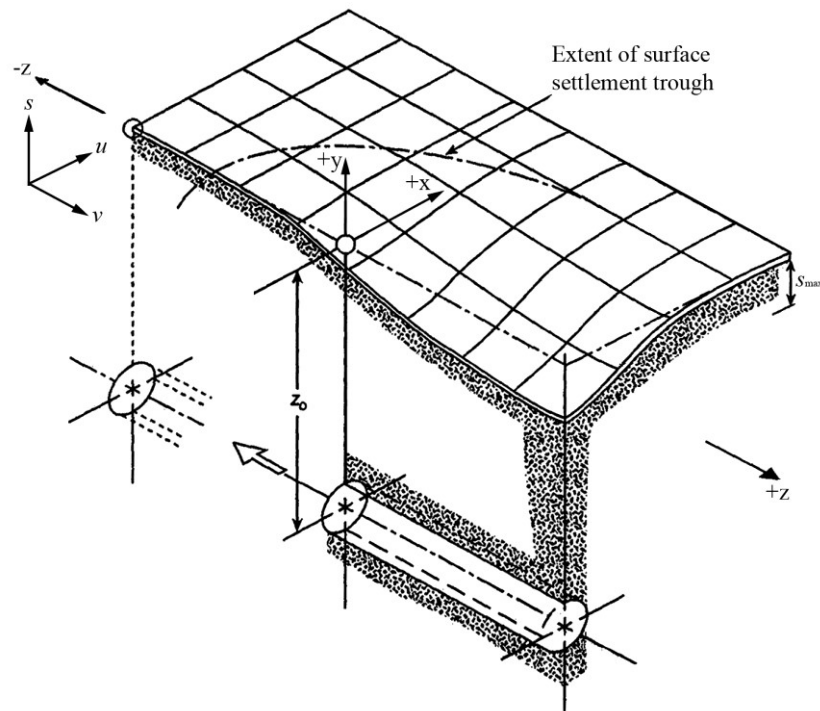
Settlement trough above an advancing tunnel (Attewell et al., 1986)
